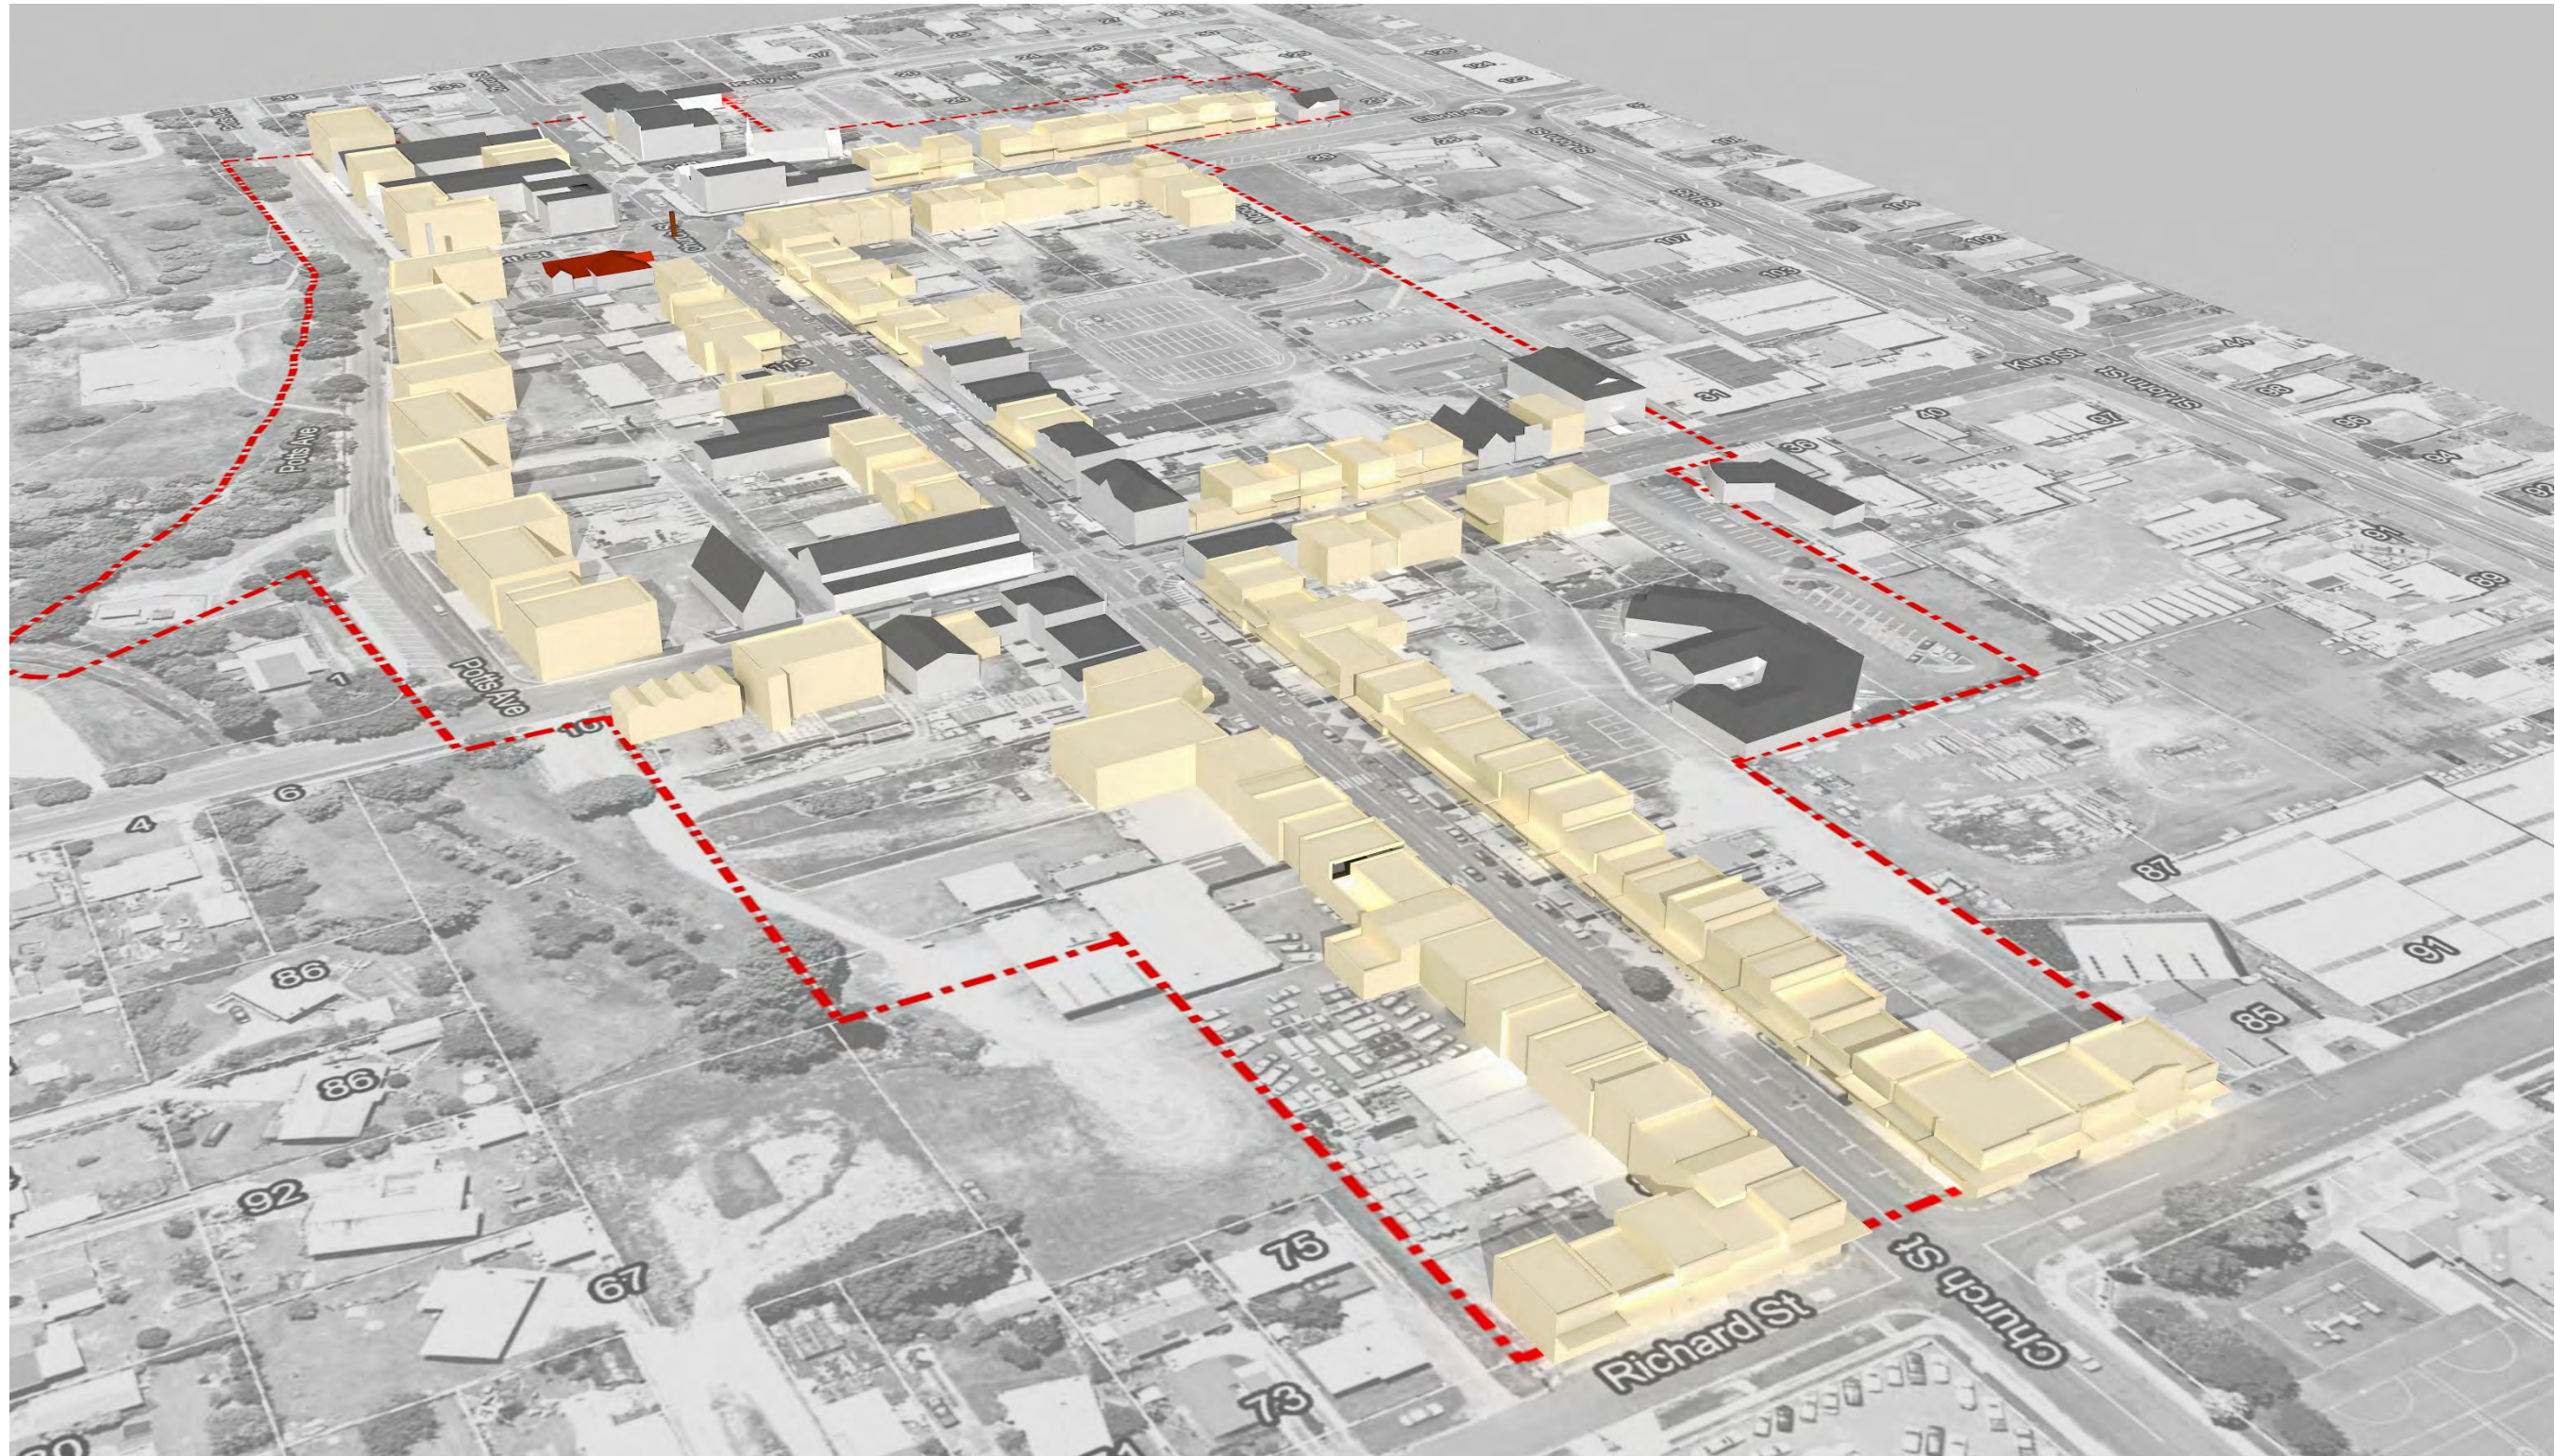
View from the South West illustrating the scale of new development encouraged by the Masterplan
